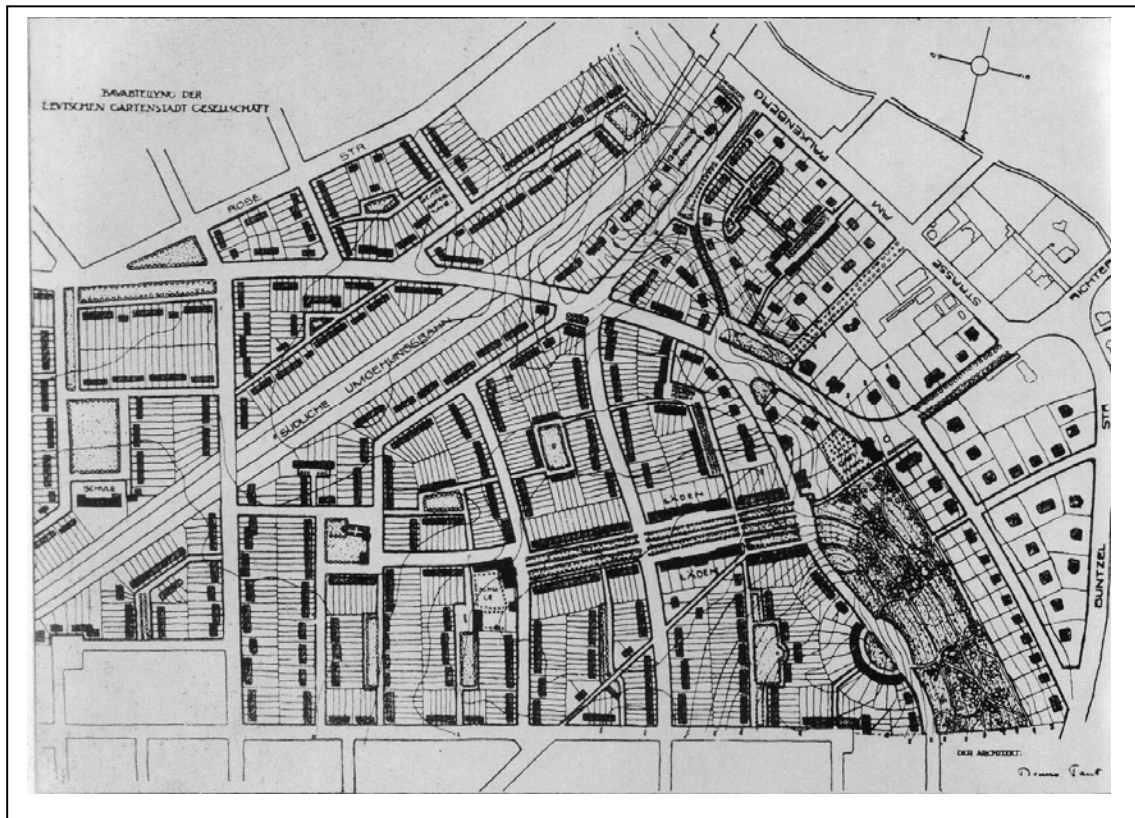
The site plan of the Falkenberg Settlement by Bruno Taut, Berlin, 1913
